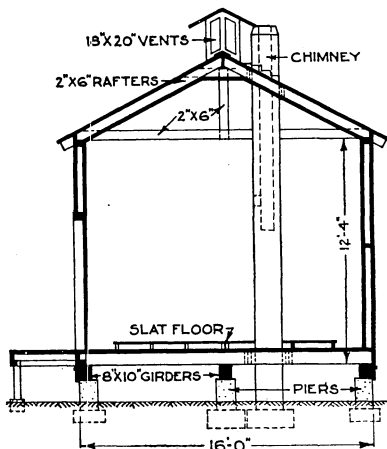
Section through a sweetpotato storage house, size 16 by 29½ feet, having a capacity of about 1,000 bushels in crates, showing various structural details. If the house is used for bin storage, the sweetpotatoes should be loaded not over 6 feet high.
